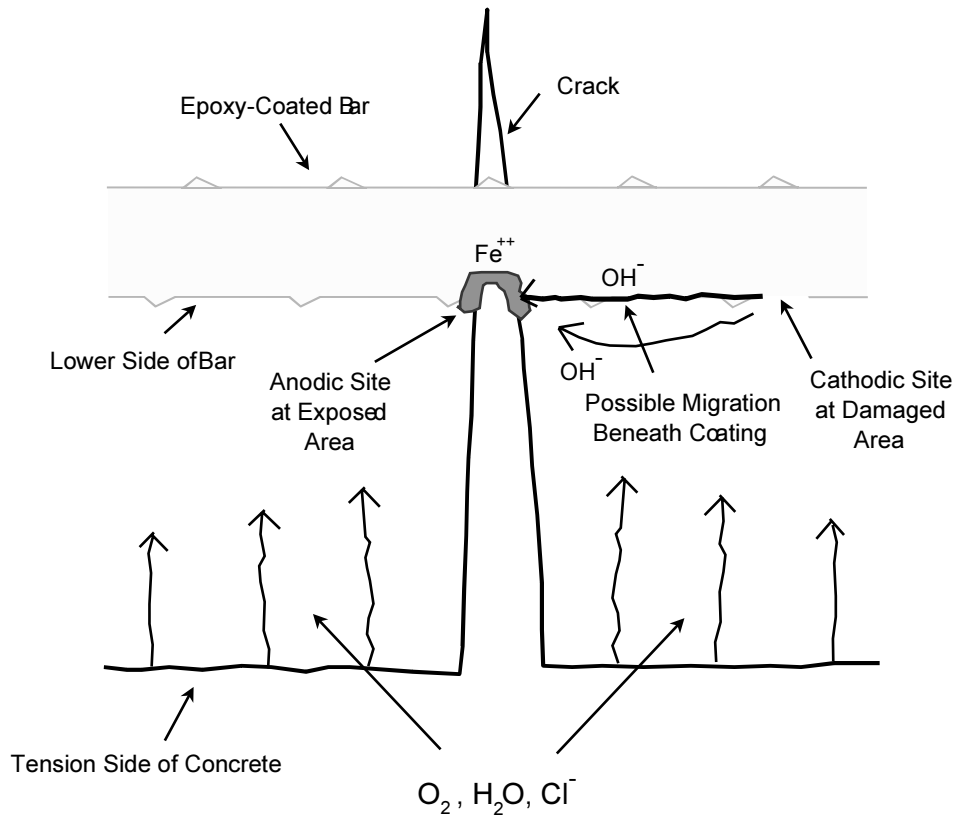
Pitting corrosion on coated bar at crack location.
